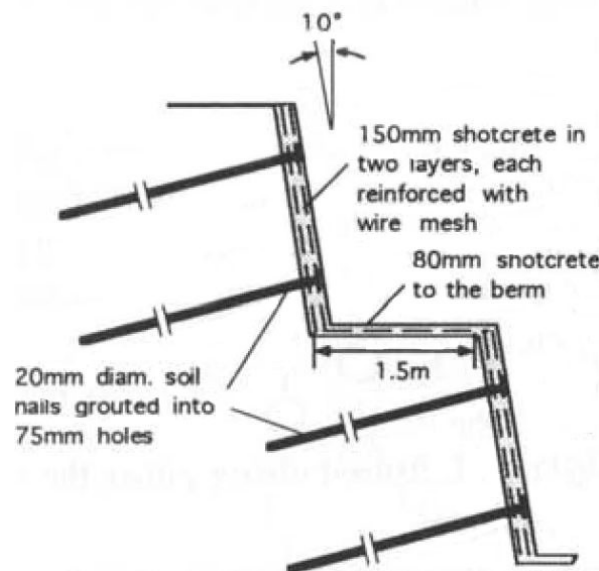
Schematic diagram of soil nailing system (Abramson et al., 2002).
